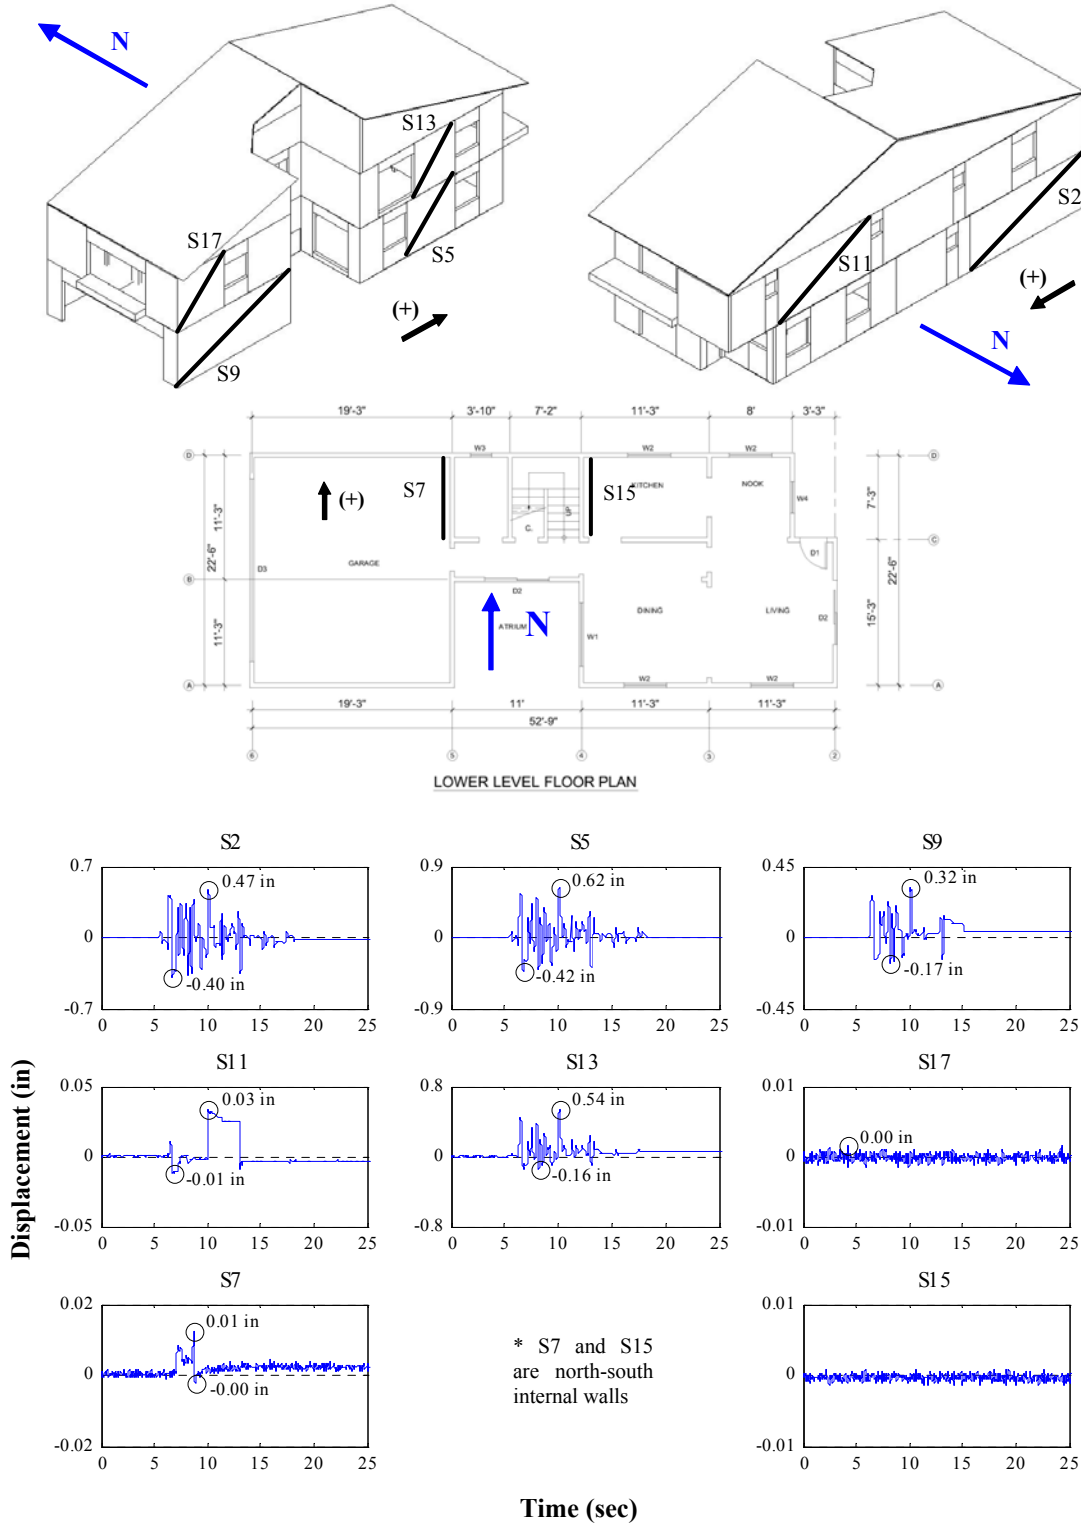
Wall deformations of east-west internal walls for Test NWP2S16
